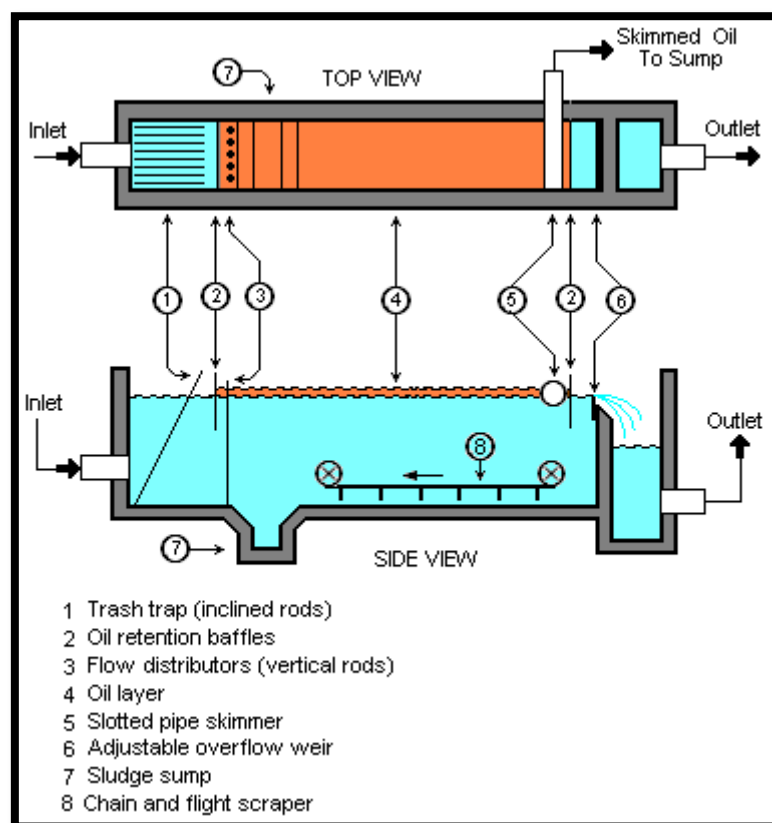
Typical oil trap (oil-water separator) system cross sectional design
